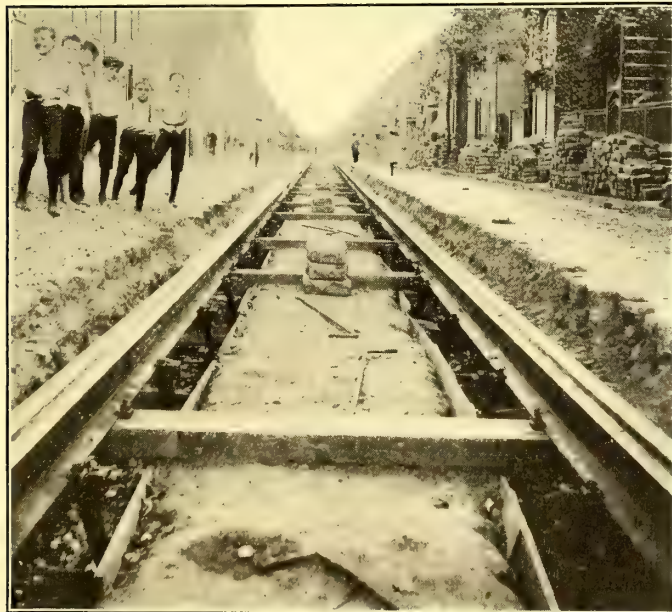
TRACK AS IN CONDITION SHOWN IN FIG. 10, BUT WITH TRENCH LINED WITH BOARDS
